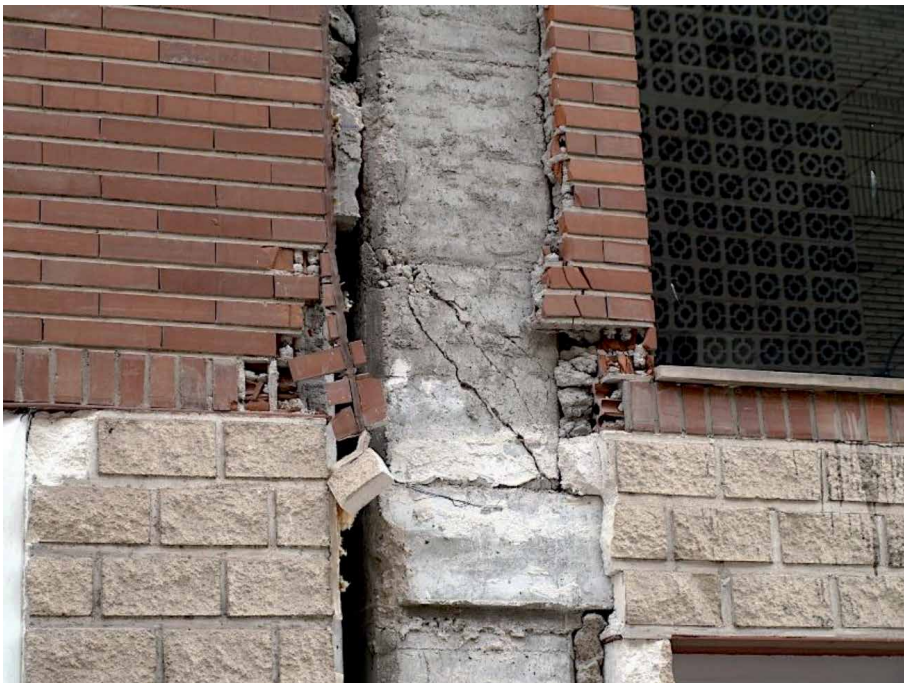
Lorca, cracks in the column-beam base suggest the incipient formation of a plastic hinge. The loss of cladding is due to a hammering effect with the adjacent building. Source: IERD.
